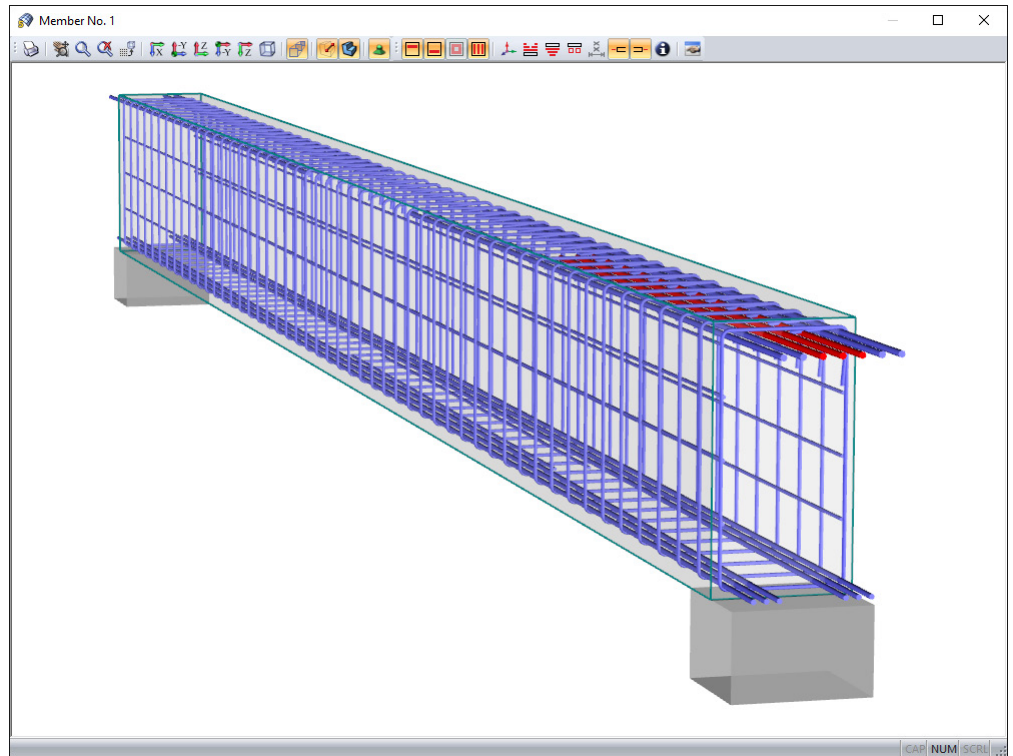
3D rendering of provided longitudinal and stirrup reinforcement
